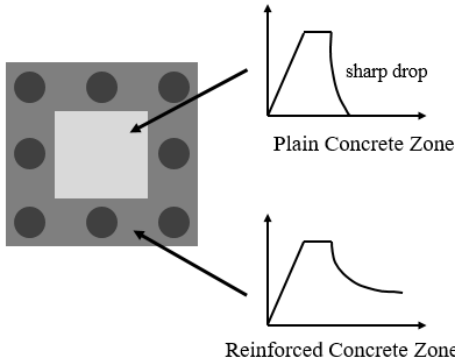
Concrete modelling using plain concrete zone and reinforced concrete zone.
